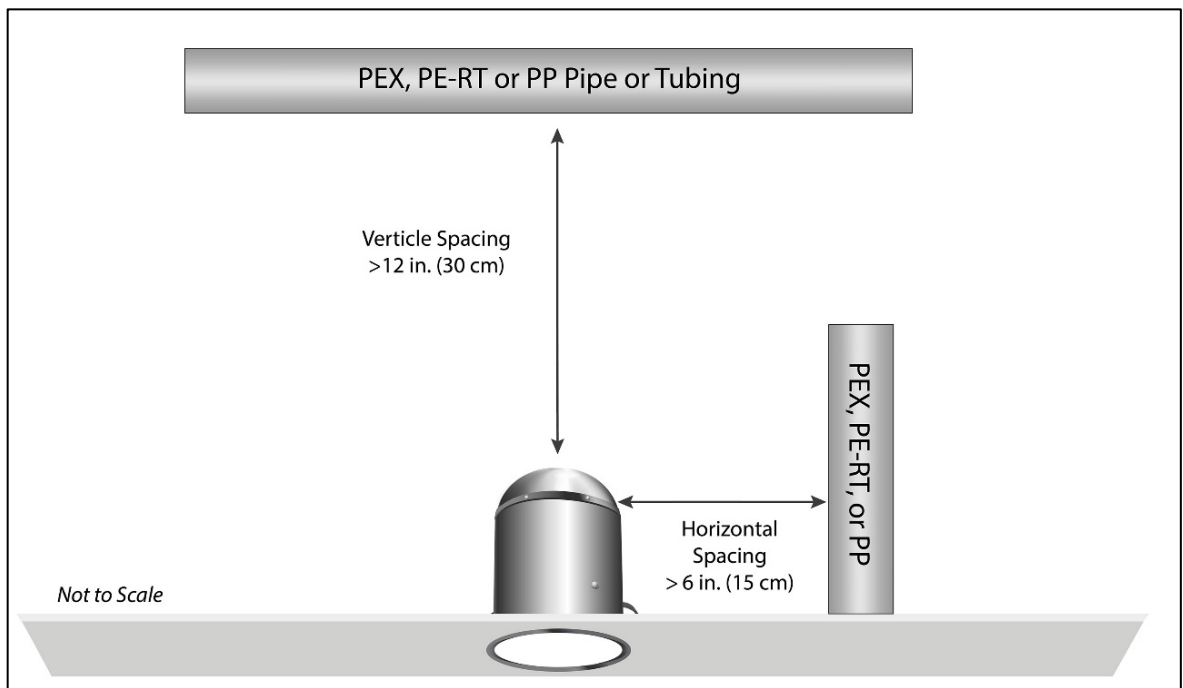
Protecting PEX, PE-RT, or PP pipe or tubing against excessive air temperature with default minimum spacing
